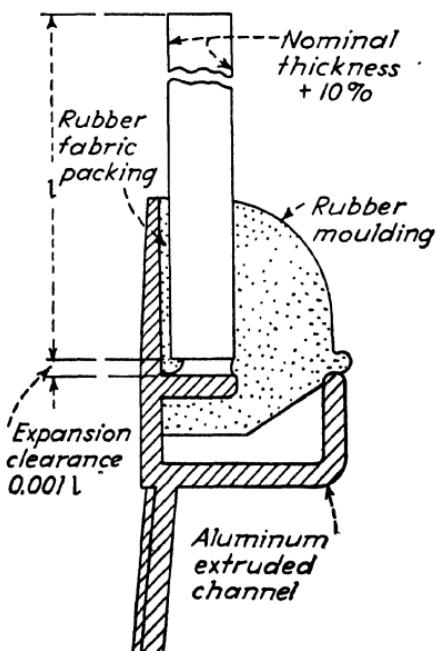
Patented frame—an aluminum extrusion. Rubber molding clamps the plastic sheet. (Courtesy of the Hunter-Sash Company.)
